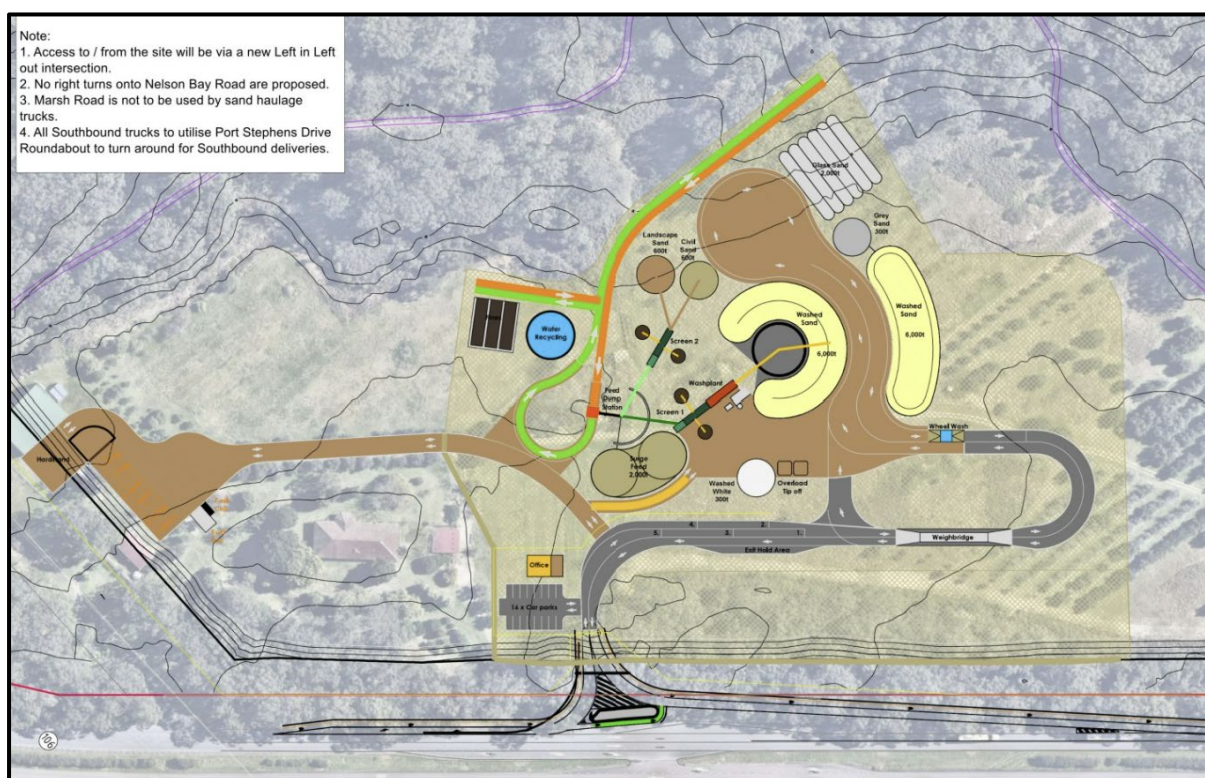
Site layout for access and wash area with extraction (Stage 1) to left of image
